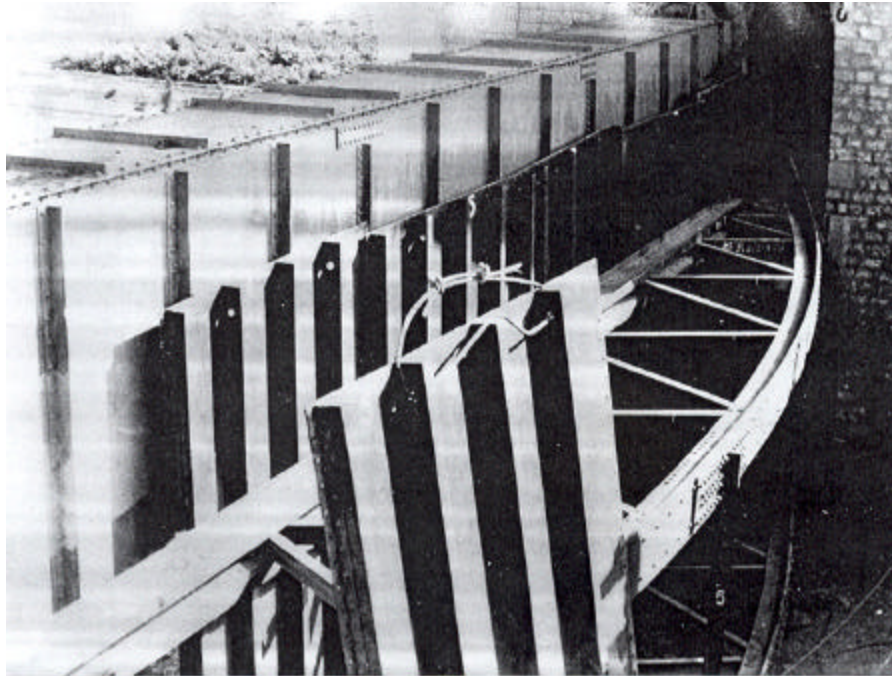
Fig. E: Gate No. 10, partially dismantled to be taken and reassembled in place of gate No. 31. Components are numbered for systematic reassembly.
